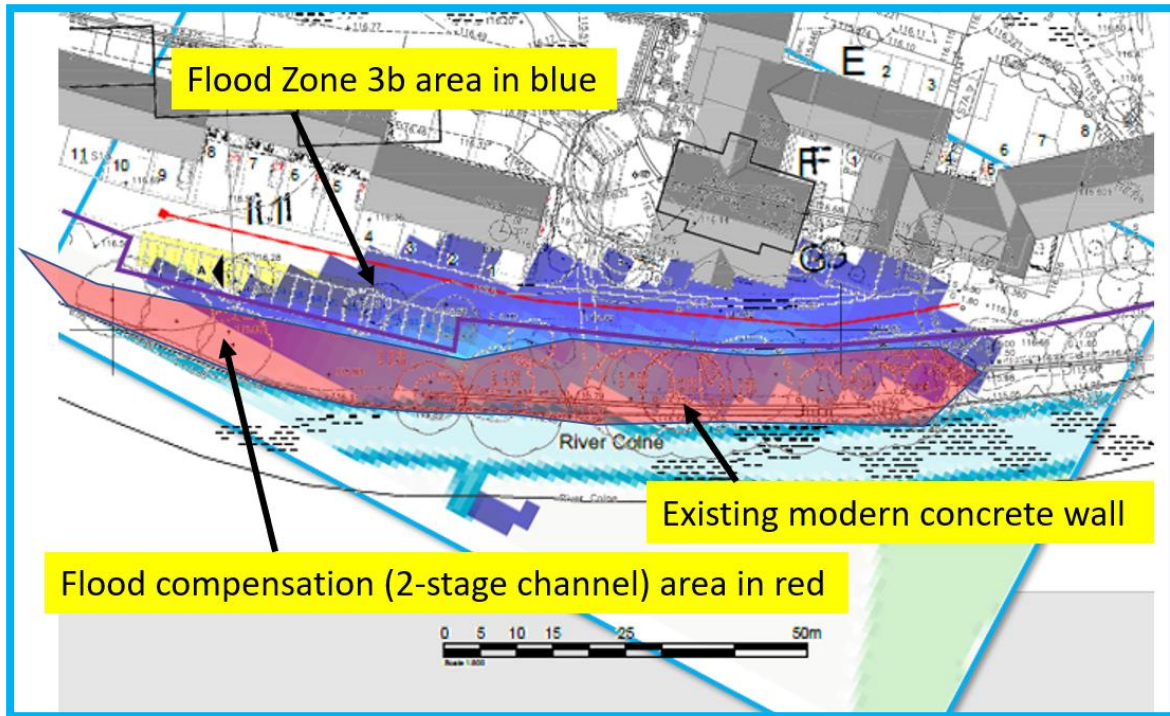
Overlay of Flood Zone 3b, over site layout and topographic survey. The purple line highlights the edge of the proposed road and parking.
